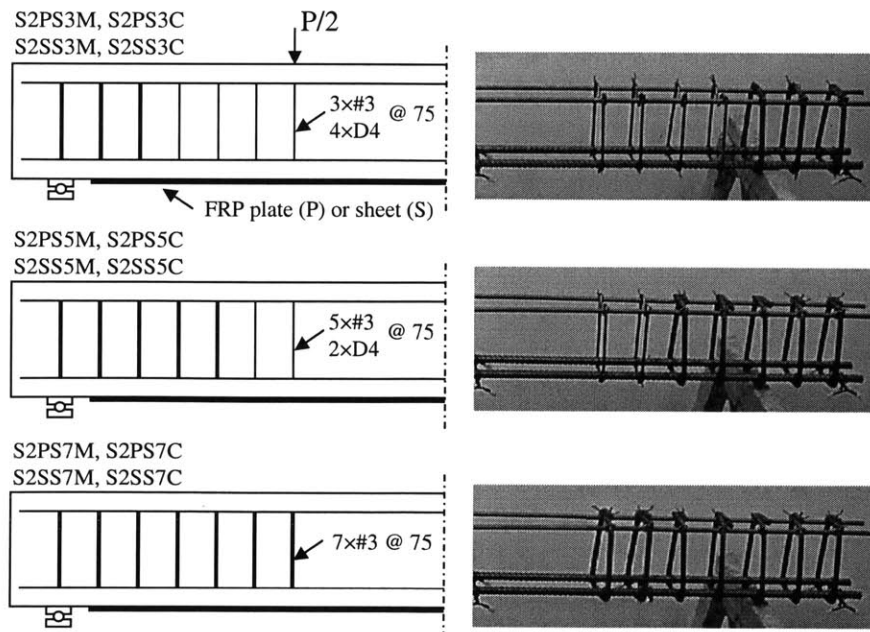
Strengthening and shear reinforcement configurations for beams in Set II (mm)
